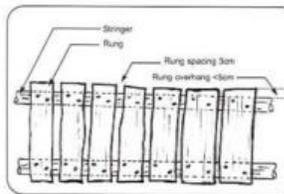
BRIDGE RUNG SPACING, RUNG OVERHANG
